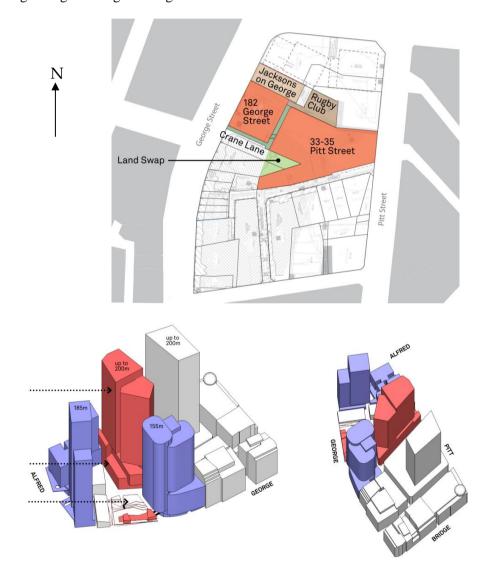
Site plan, north-west and south-west view of proposed development at 182 George and 33-35 Pitt Street
